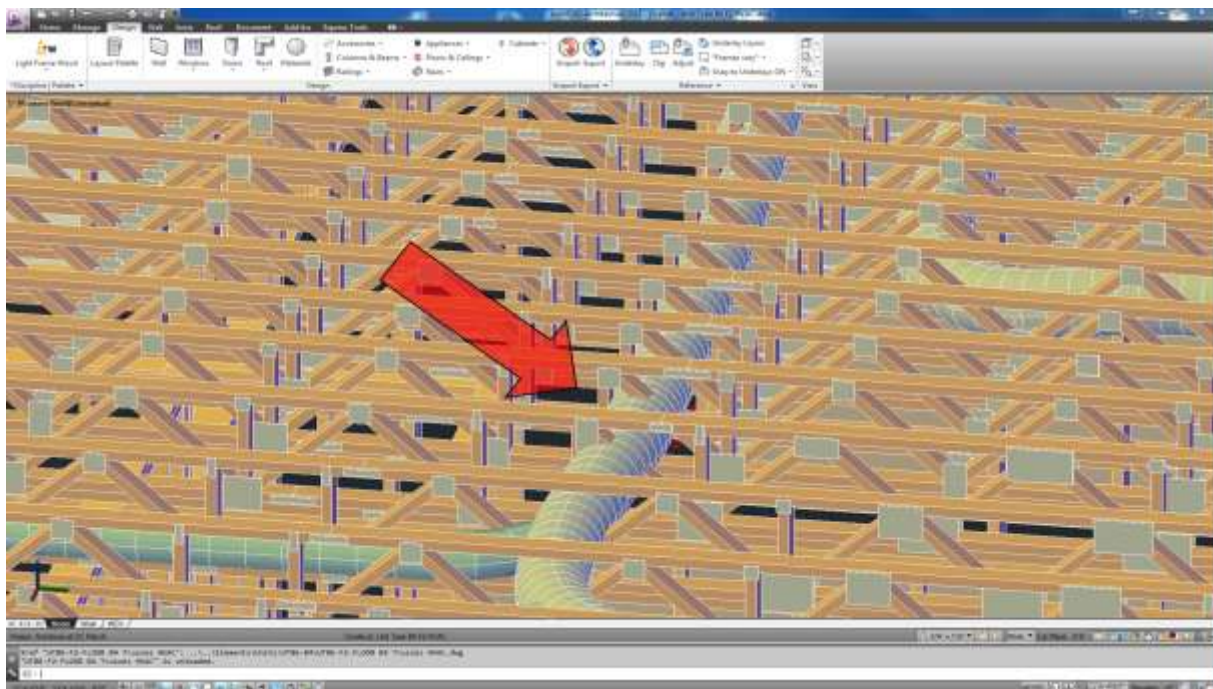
Floor Trusses are intended to accommodate MEP such as this Ductwork
